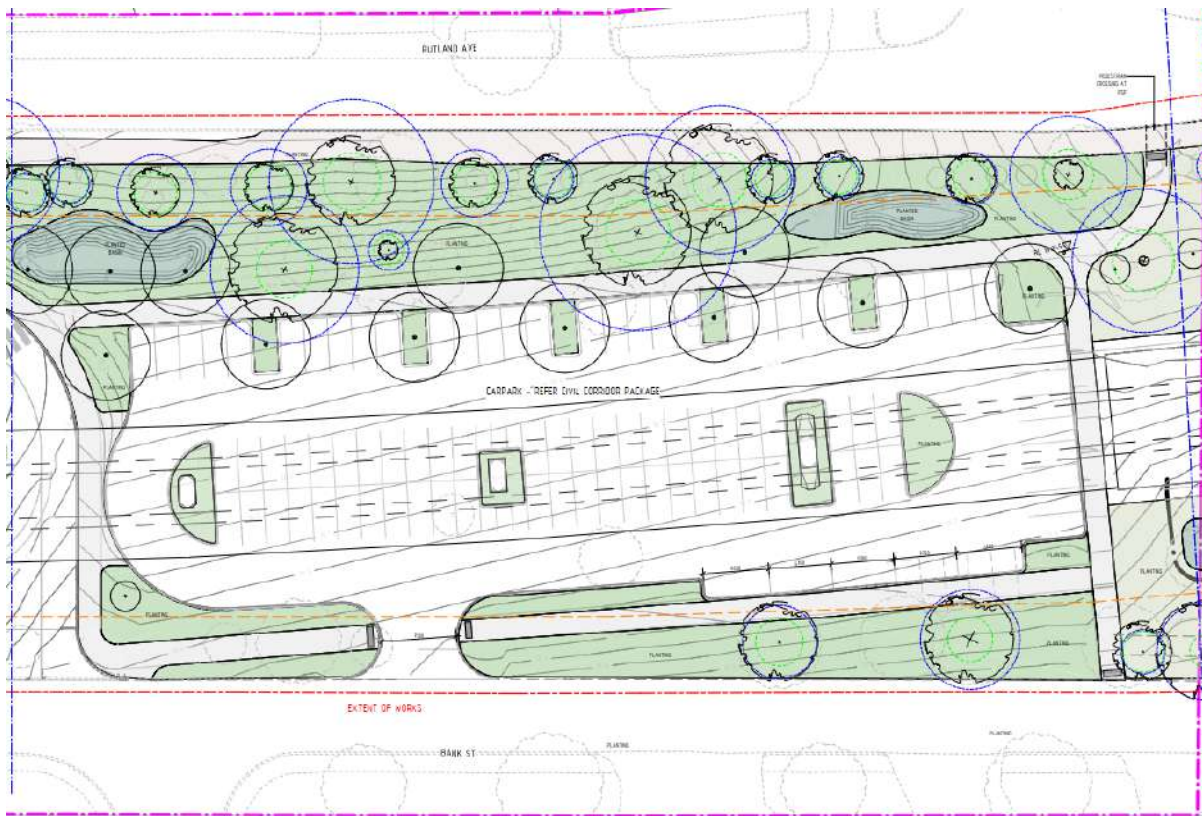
OATS STREET STATION CAR PARKING LAYOUT 2
